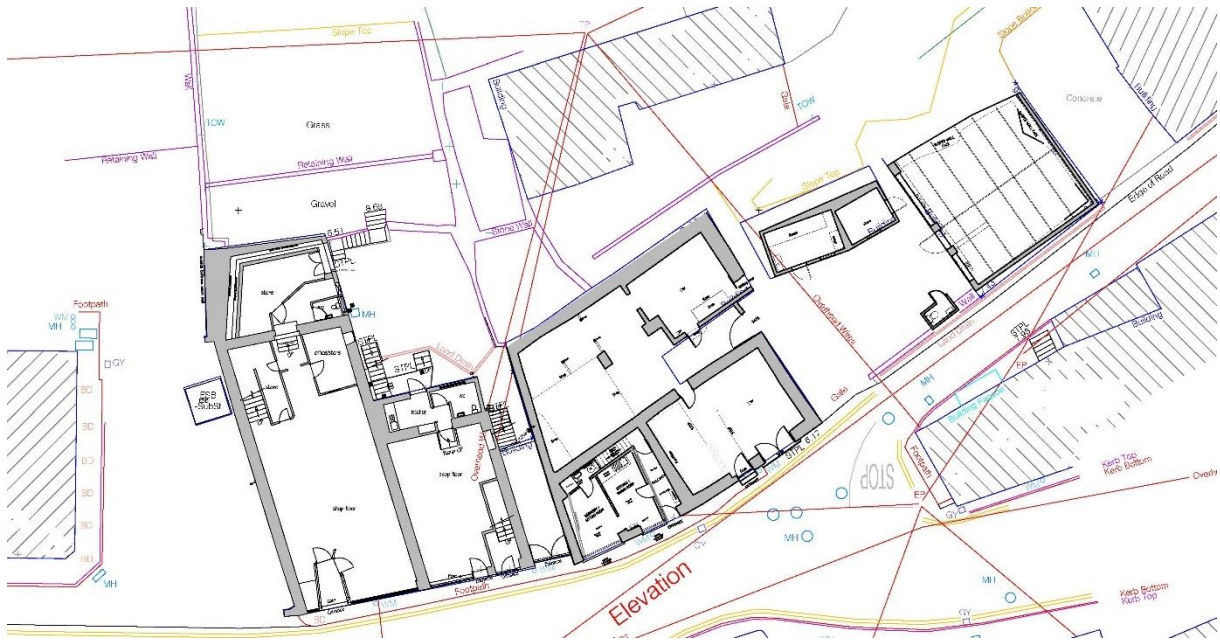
Extract of existing floor plans overlaid on site survey, Cork County Council (2023)
